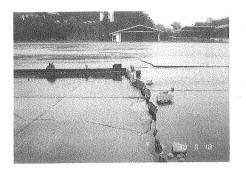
Extensive crack in runway of Baguio (Loakan) Airport
